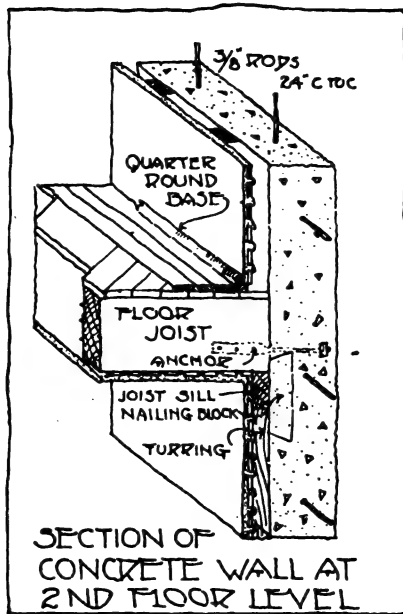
WALL AND FLOOR SECTION AT SECOND STORY LEVEL
